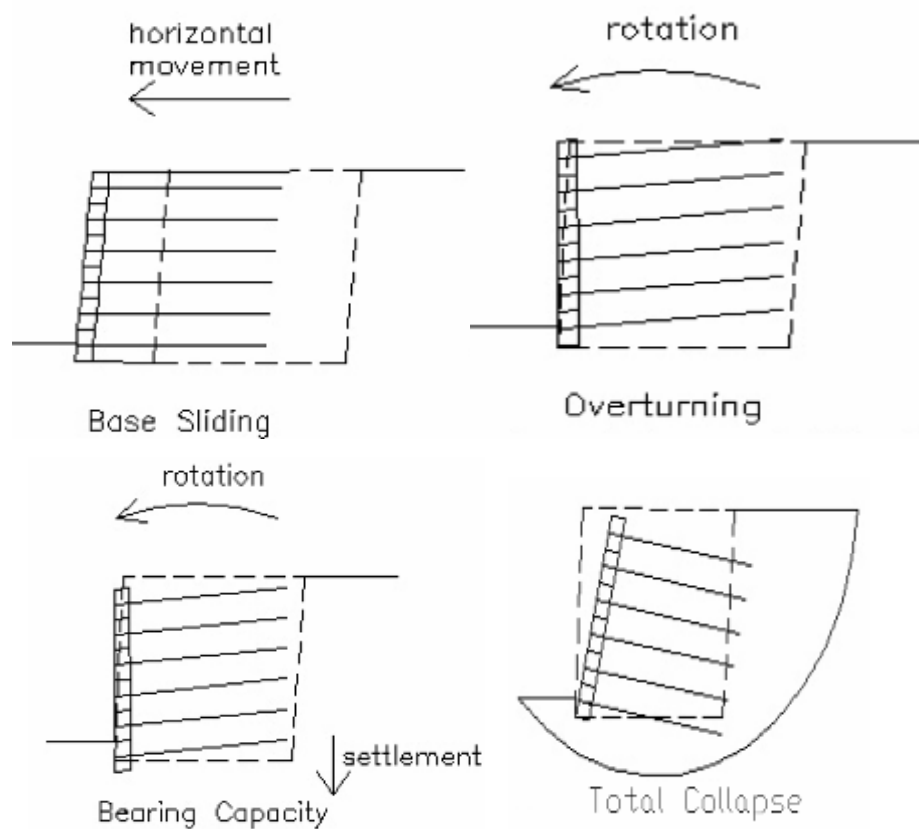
Possible exterior stability collapses for reinforced earth structures
